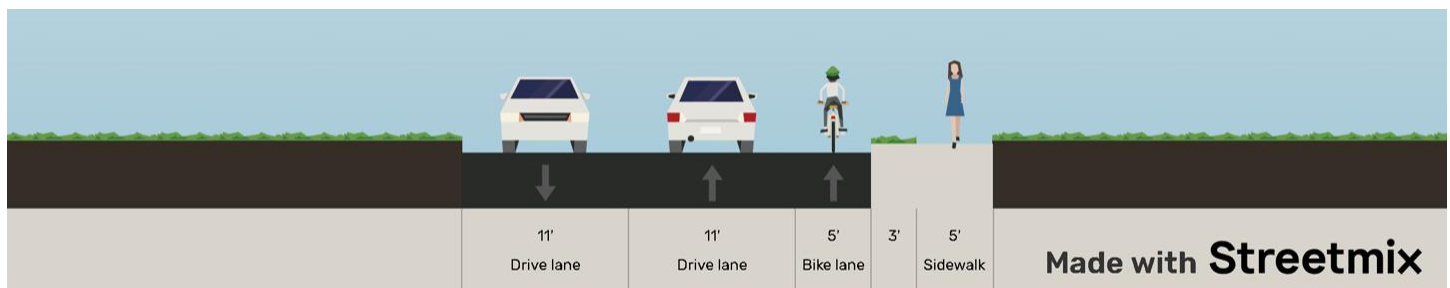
Northeast 72nd Avenue from Northeast 69th Street to Northeast 78th Street has two travel lanes with an intermittent unbuffered bike lane and sidewalk facility mainly on the eastern side of the street.
